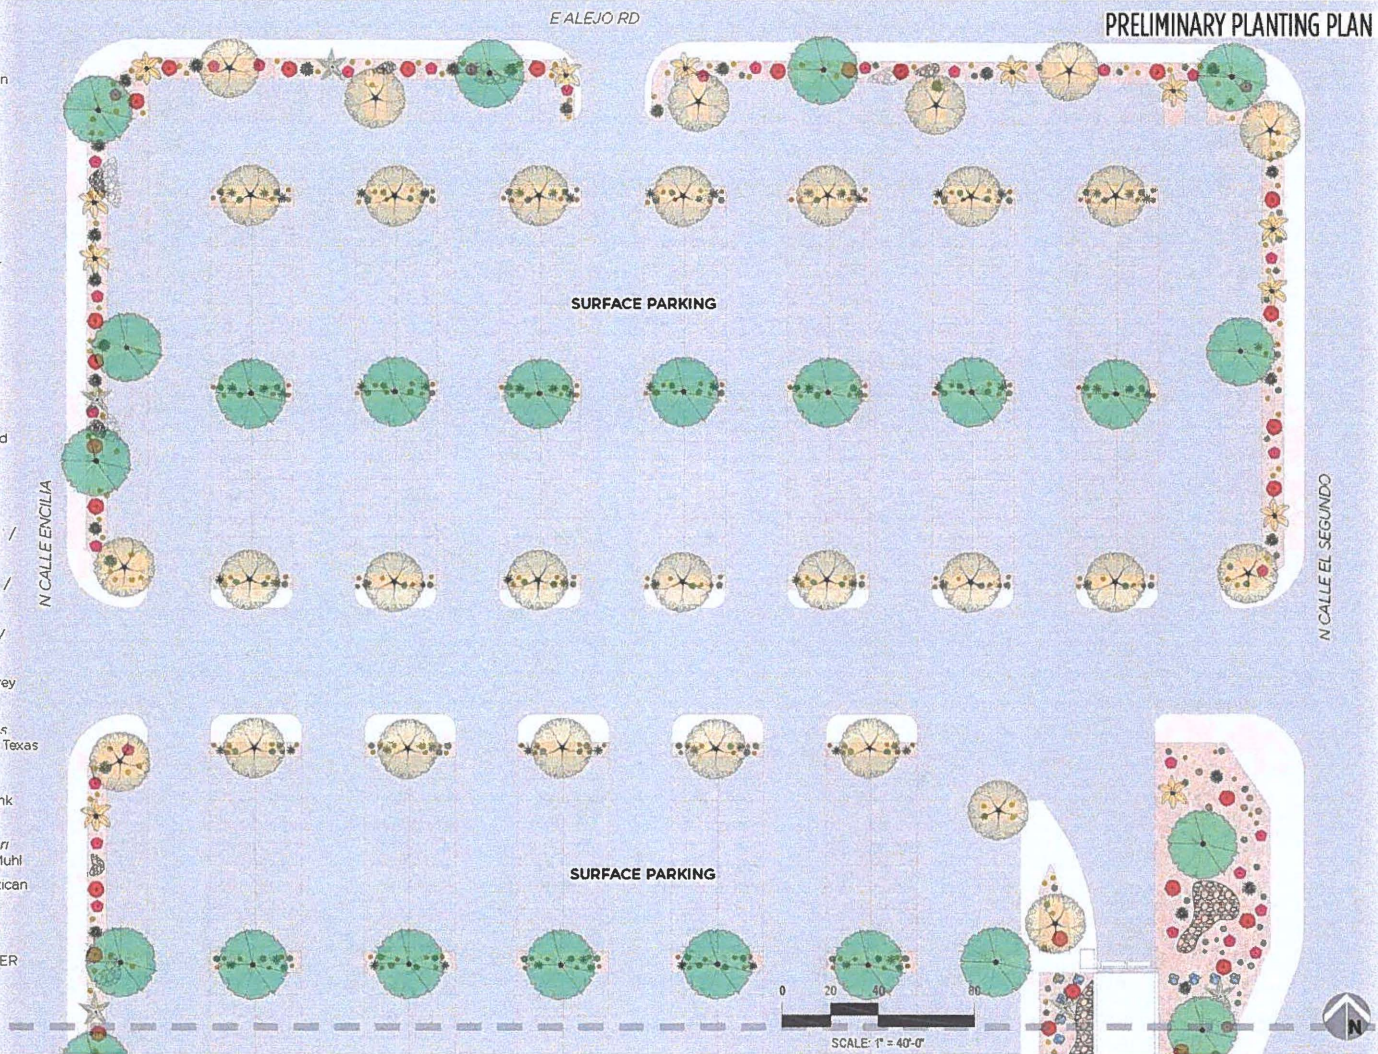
PRELIMINARY LANDSCAPE PLAN
